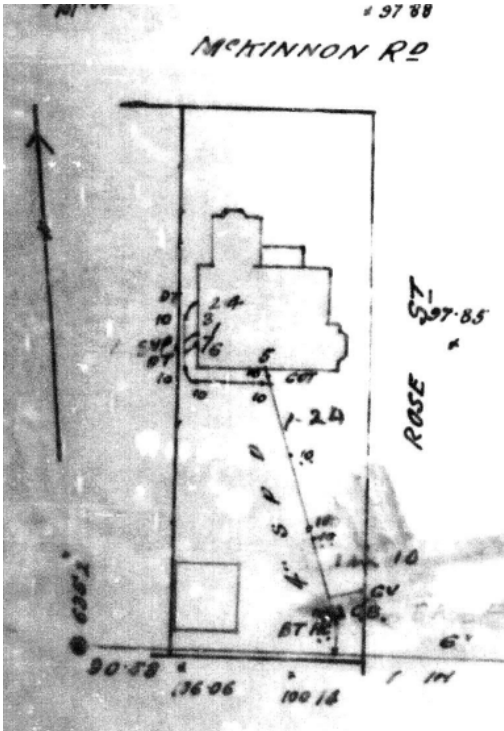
Footprint of the house and garage, dated 1948, annotated with sewerage works (Source: Plan of Drainage No. 243865).
